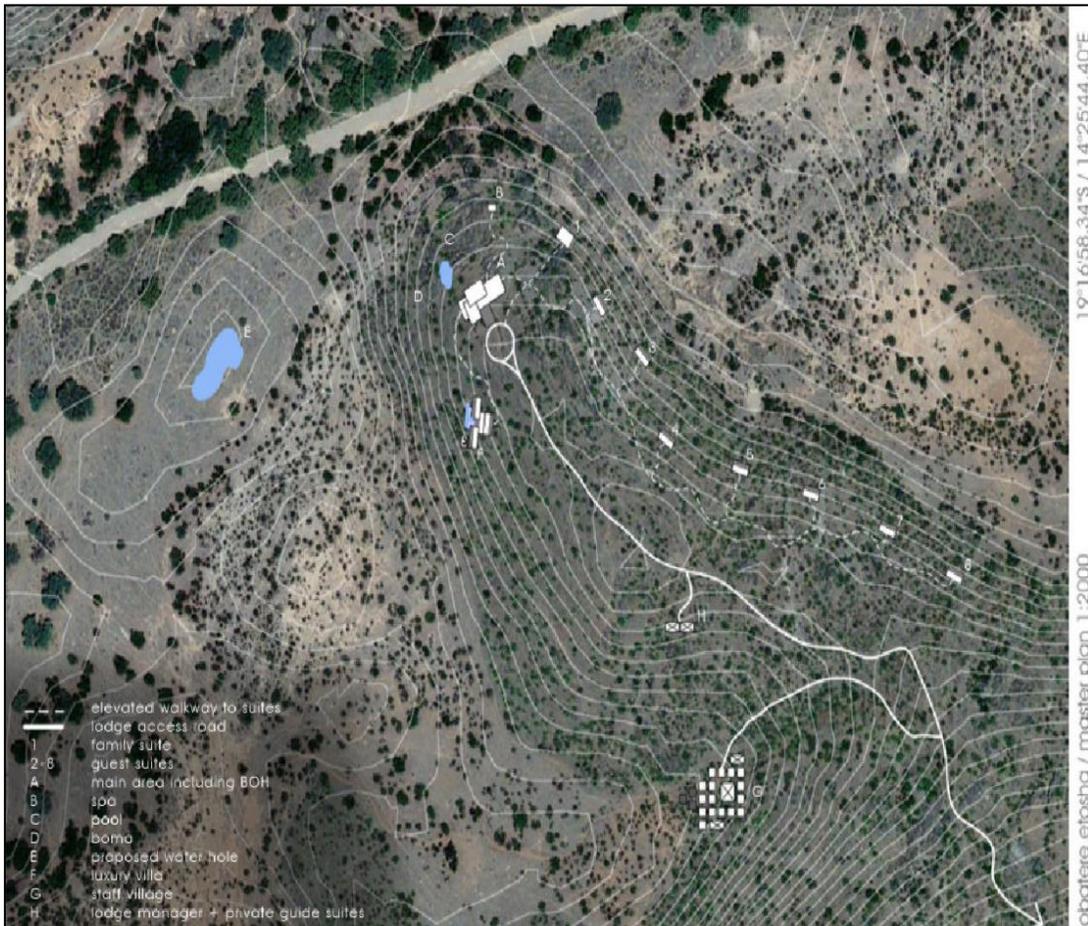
Migs and Drew Architects Site utilisation plan (zoomed)
